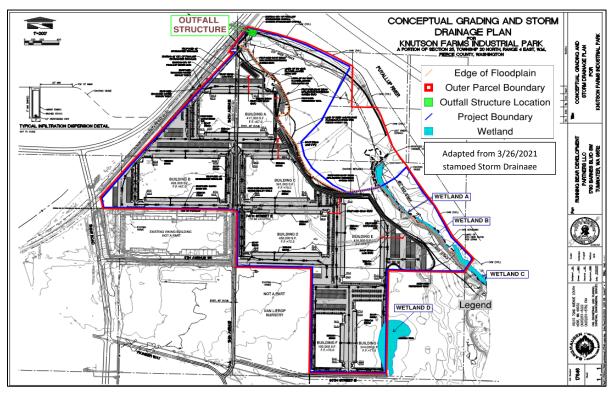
Showing Location of Stormwater Outfall Structure at Northern End of the Project Site
